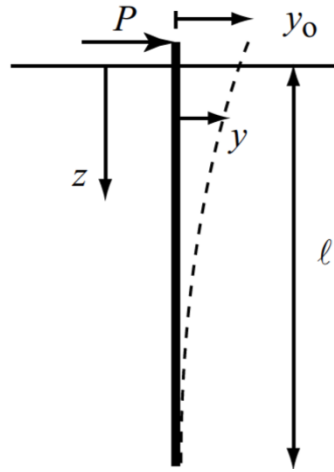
Pile under lateral loading (from Muir Wood, 2004)
